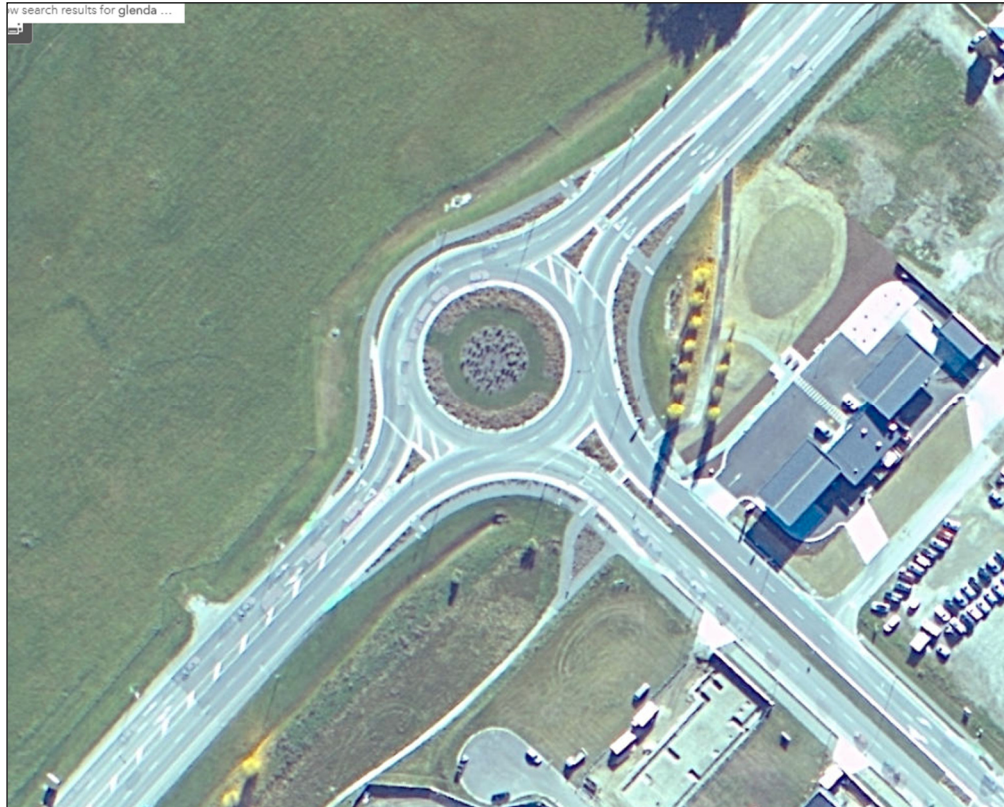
The existing roundabout layout at the intersection of Hawthorne Drive with State Highway 6.
